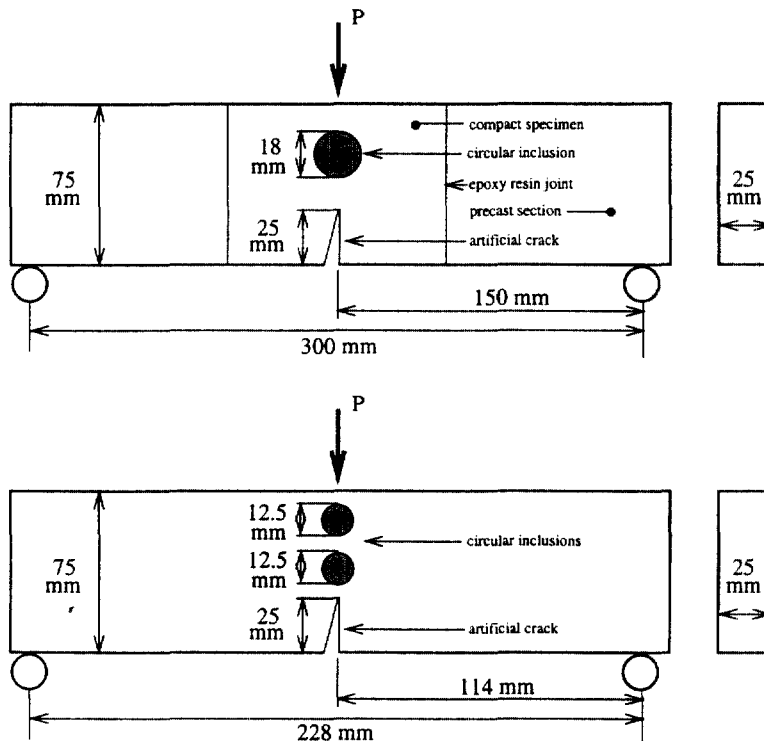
Three-point bending loading used on circular inclusion specimens.
